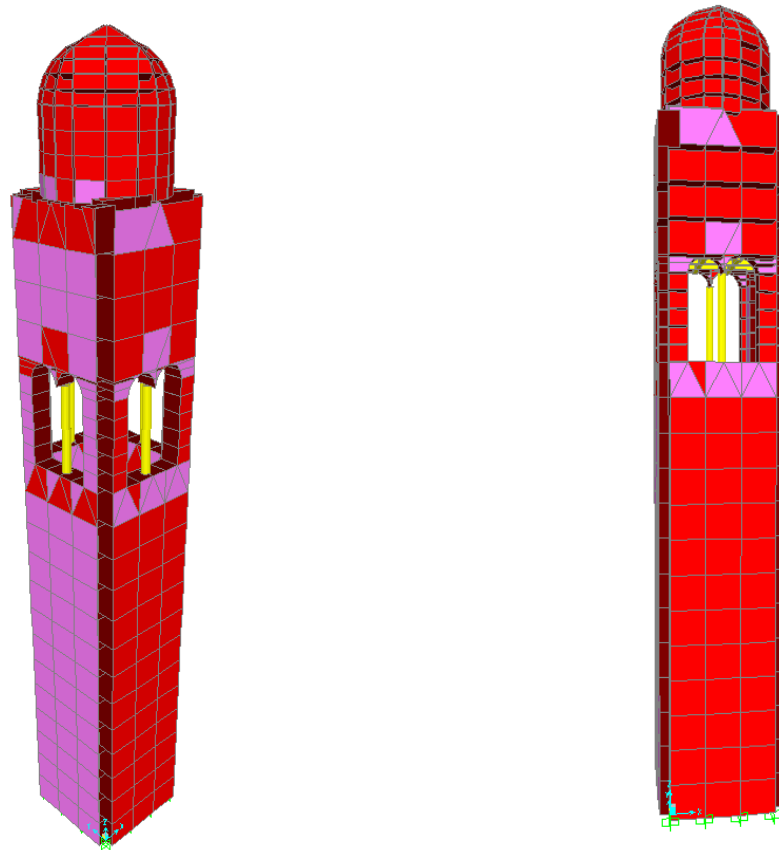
The analytical model with 3D shell and frame elements (F. E. M.) of the brick masonry bell tower of St. Spyridon church.
